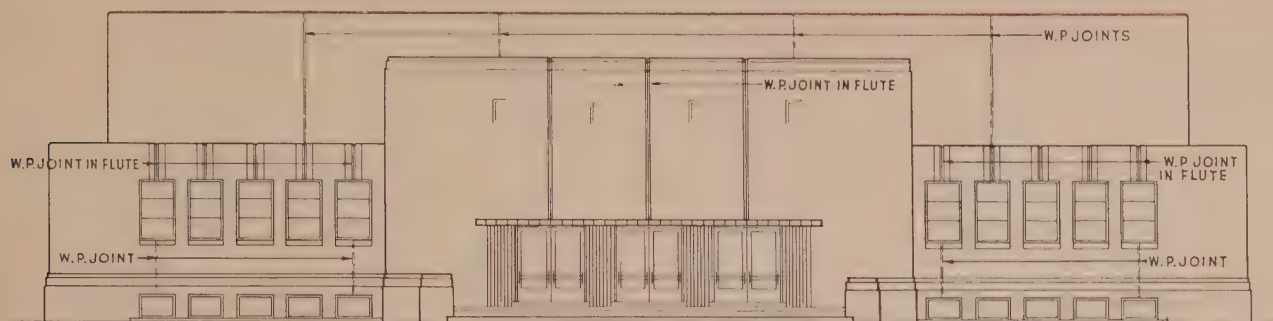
ELEVATION OF BUILDING SHOWING LOCATION OF WEAKENED PLANE JOINTS
